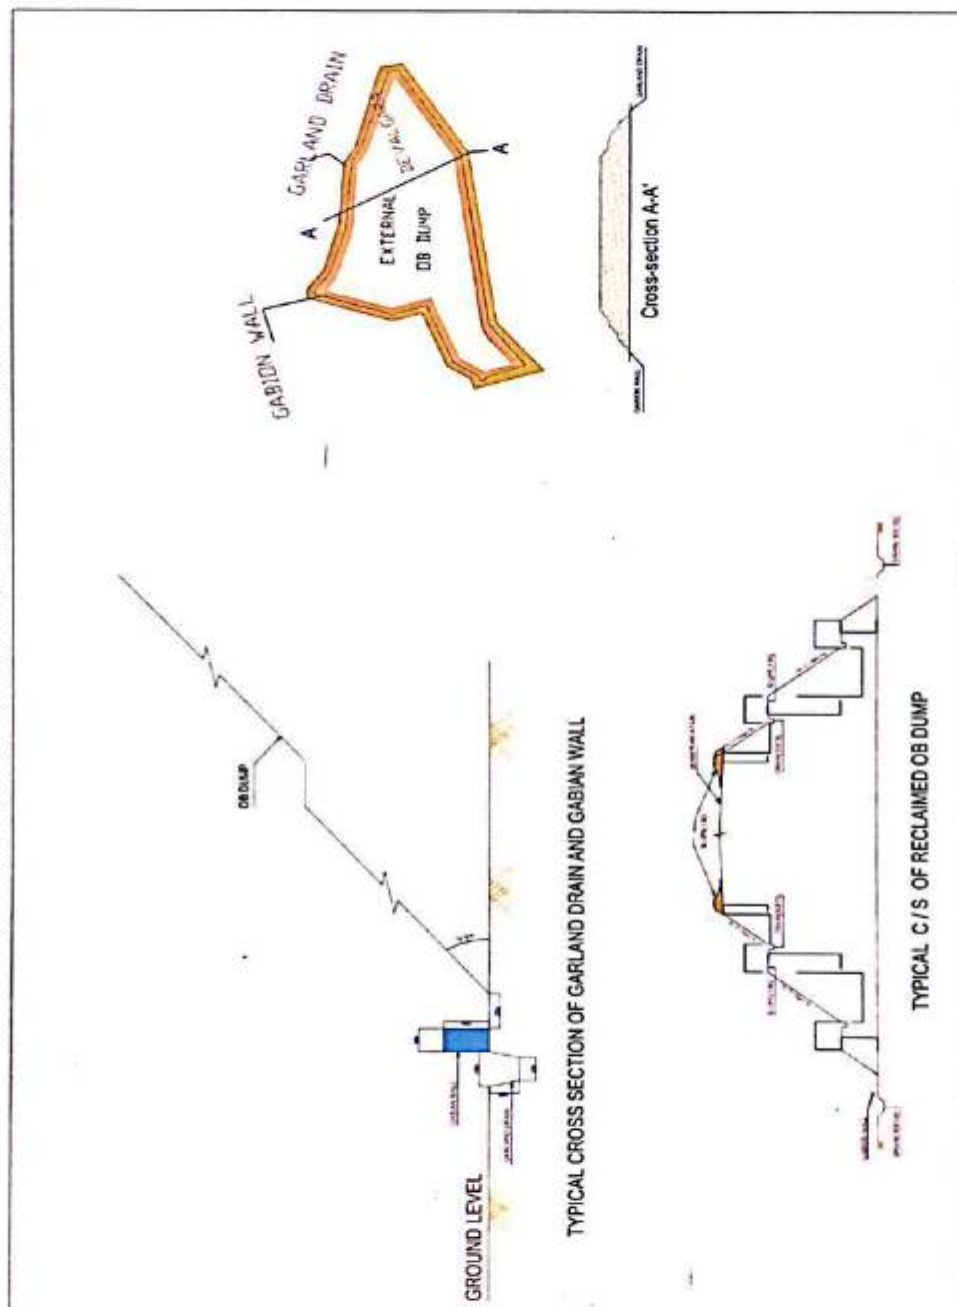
Typical Cross section of OB dump for slope protection and showing Gabion wall and Garland drain
